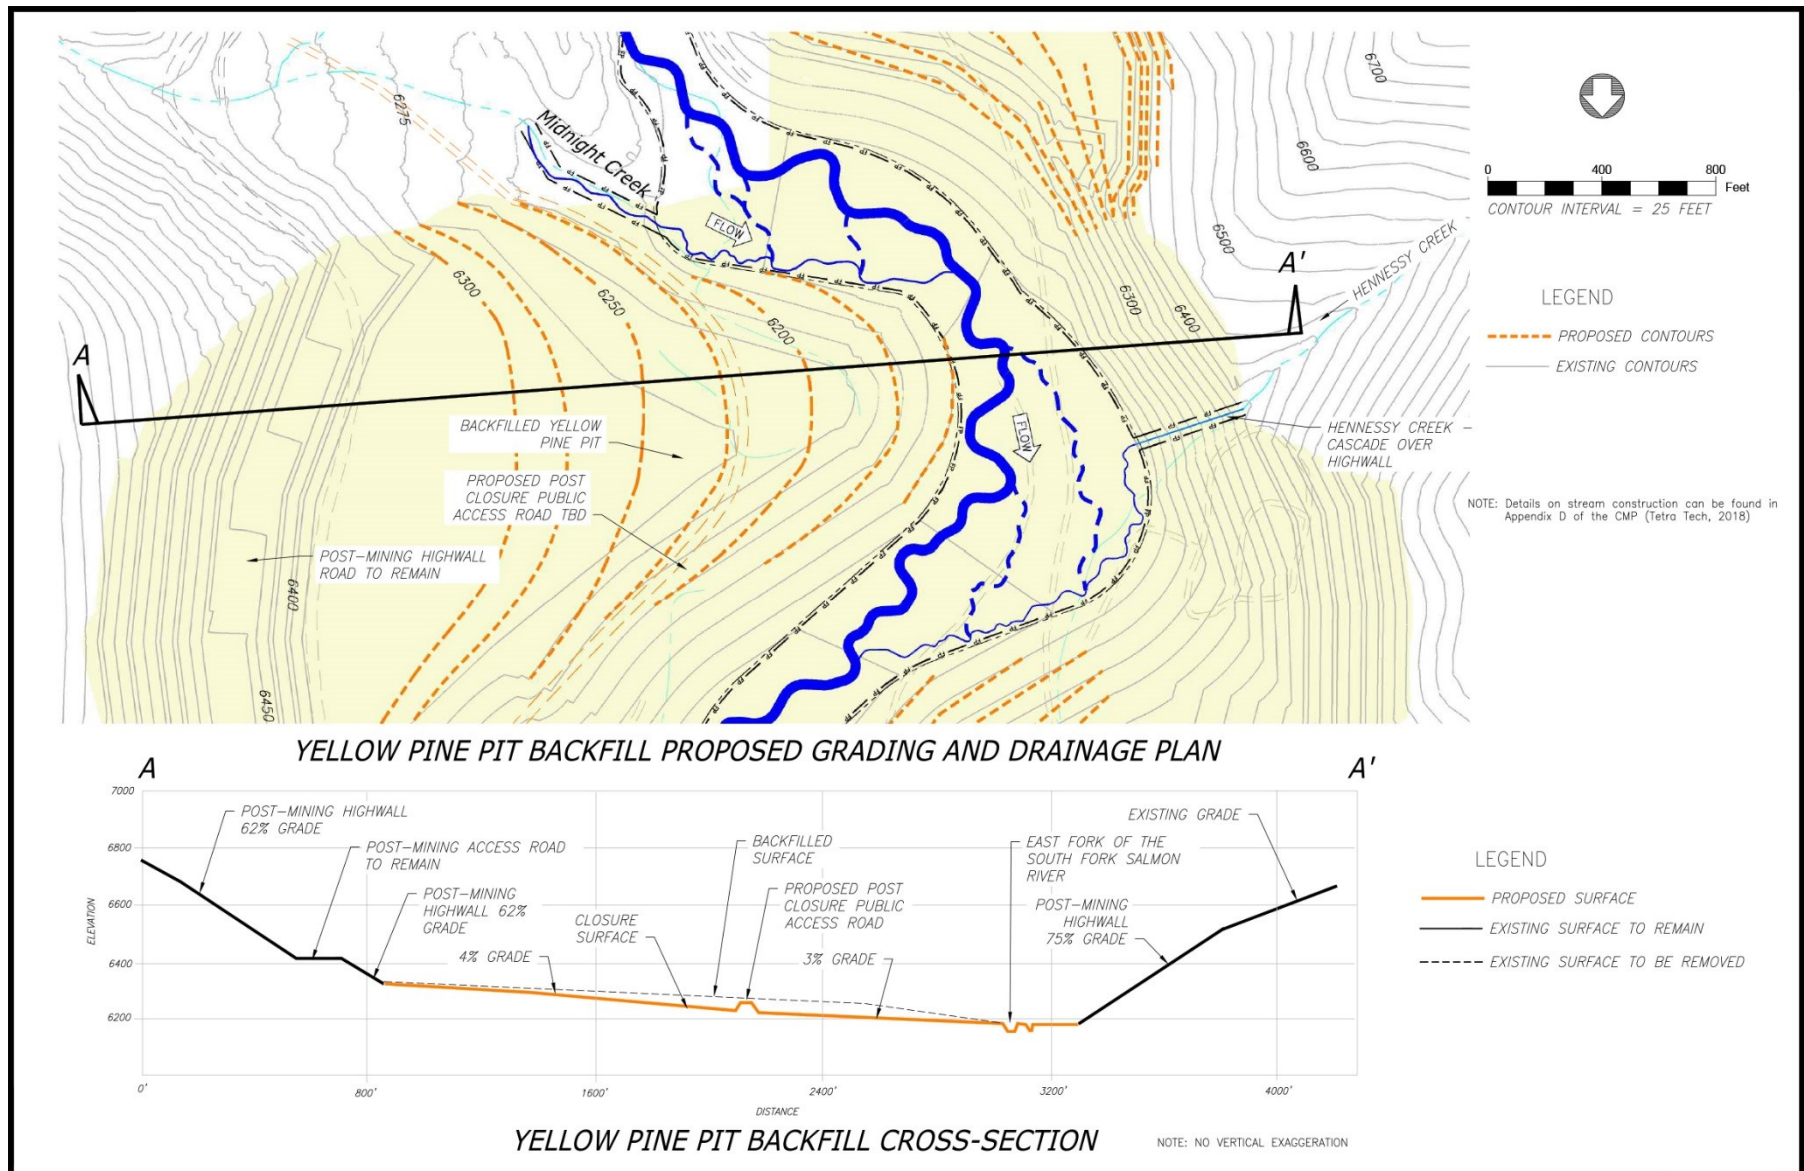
Yellow Pine Pit Plan and Cross-Section
